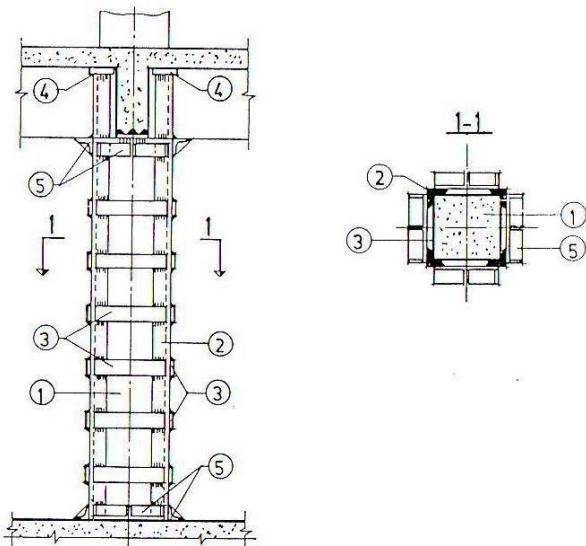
Strengthening of column with steel profiles at each corner; 1-existing column, 2-steel angle profile, 3-steel plate, 4-supporting plate, 5-angle profile.
